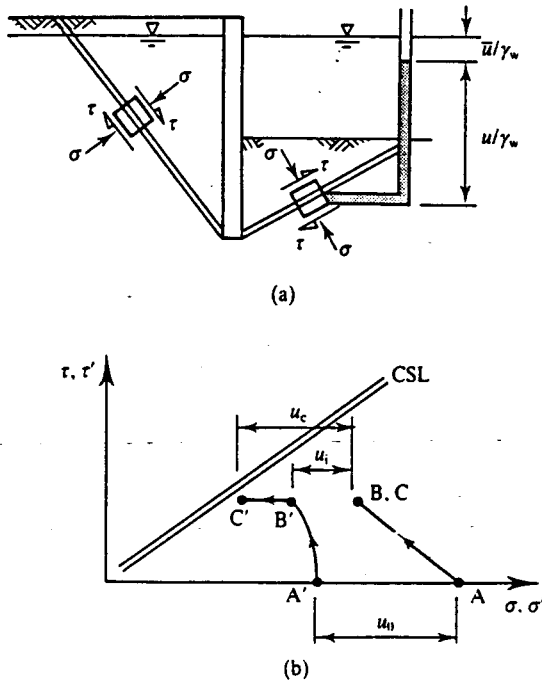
Changes of stress and pore pressure for a wall retaining an excavation.
